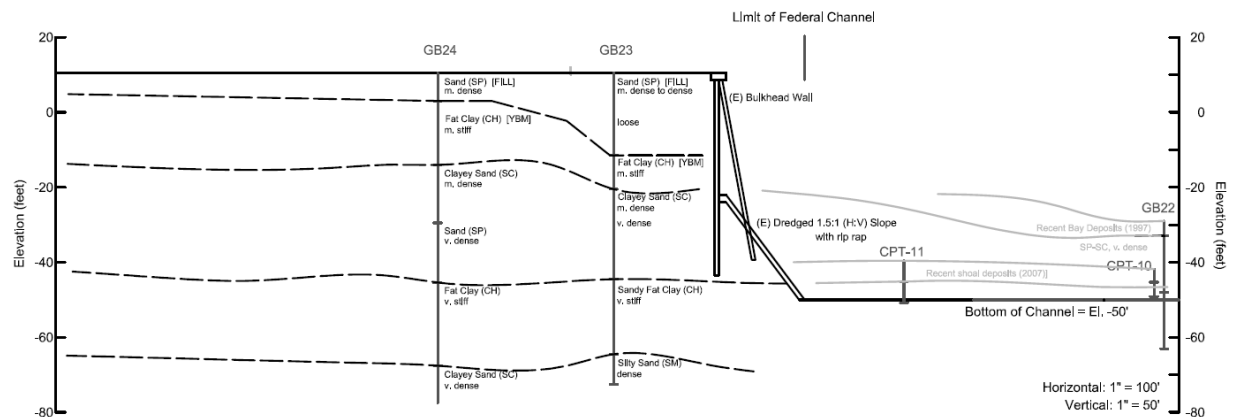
Alameda/Fisk Property Cross-Section D-D'(Existing)
